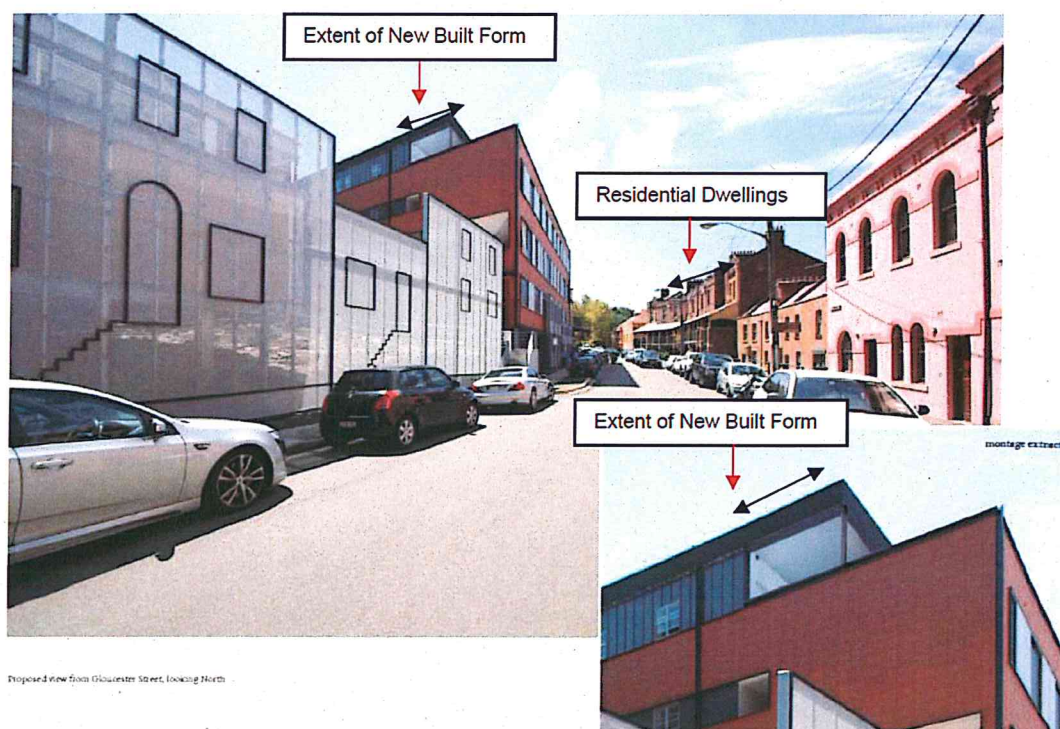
Proposed view of subject site when viewed from the south-eastern side of Gloucester Street
